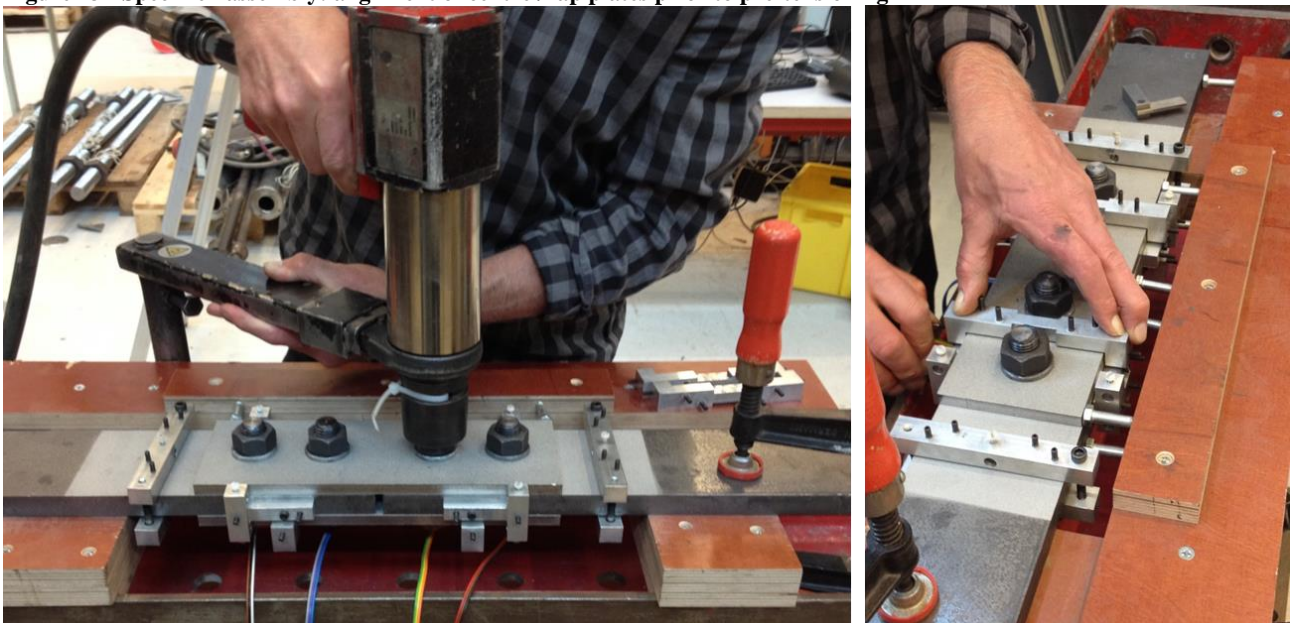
Application of pretension using air driven torque tool; mounting of LVDT brackets on lap plates
